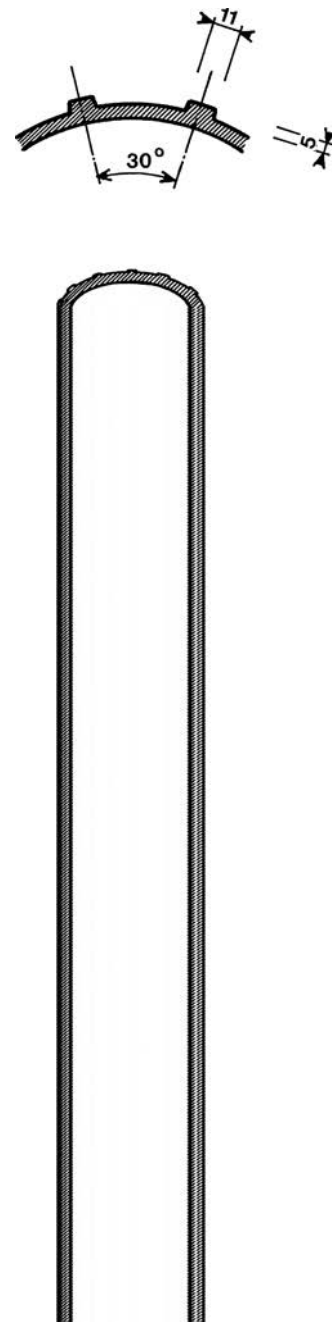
Longitudinal channels of the ducts at the Higashi-Kobe Bridge.
